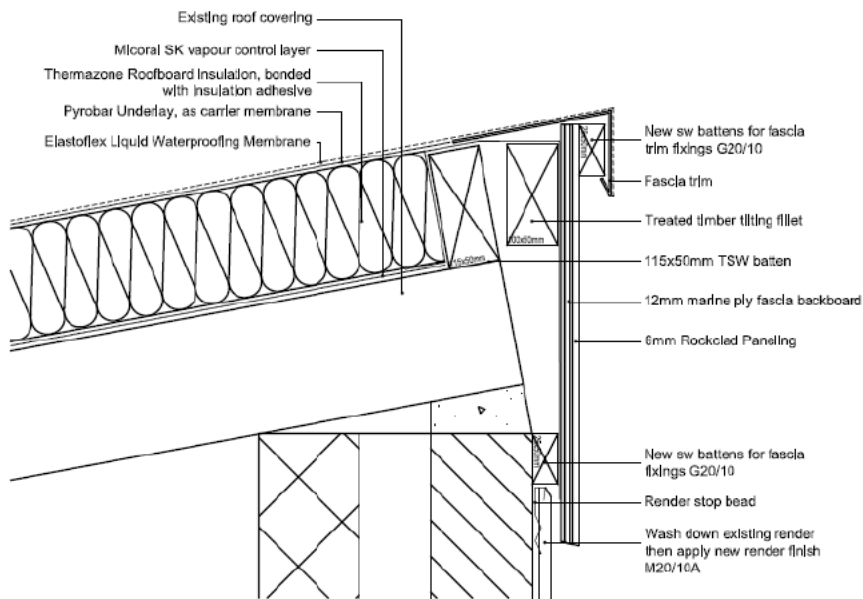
Section detail through eaves of refurbished 'flat' roof system (upper)
